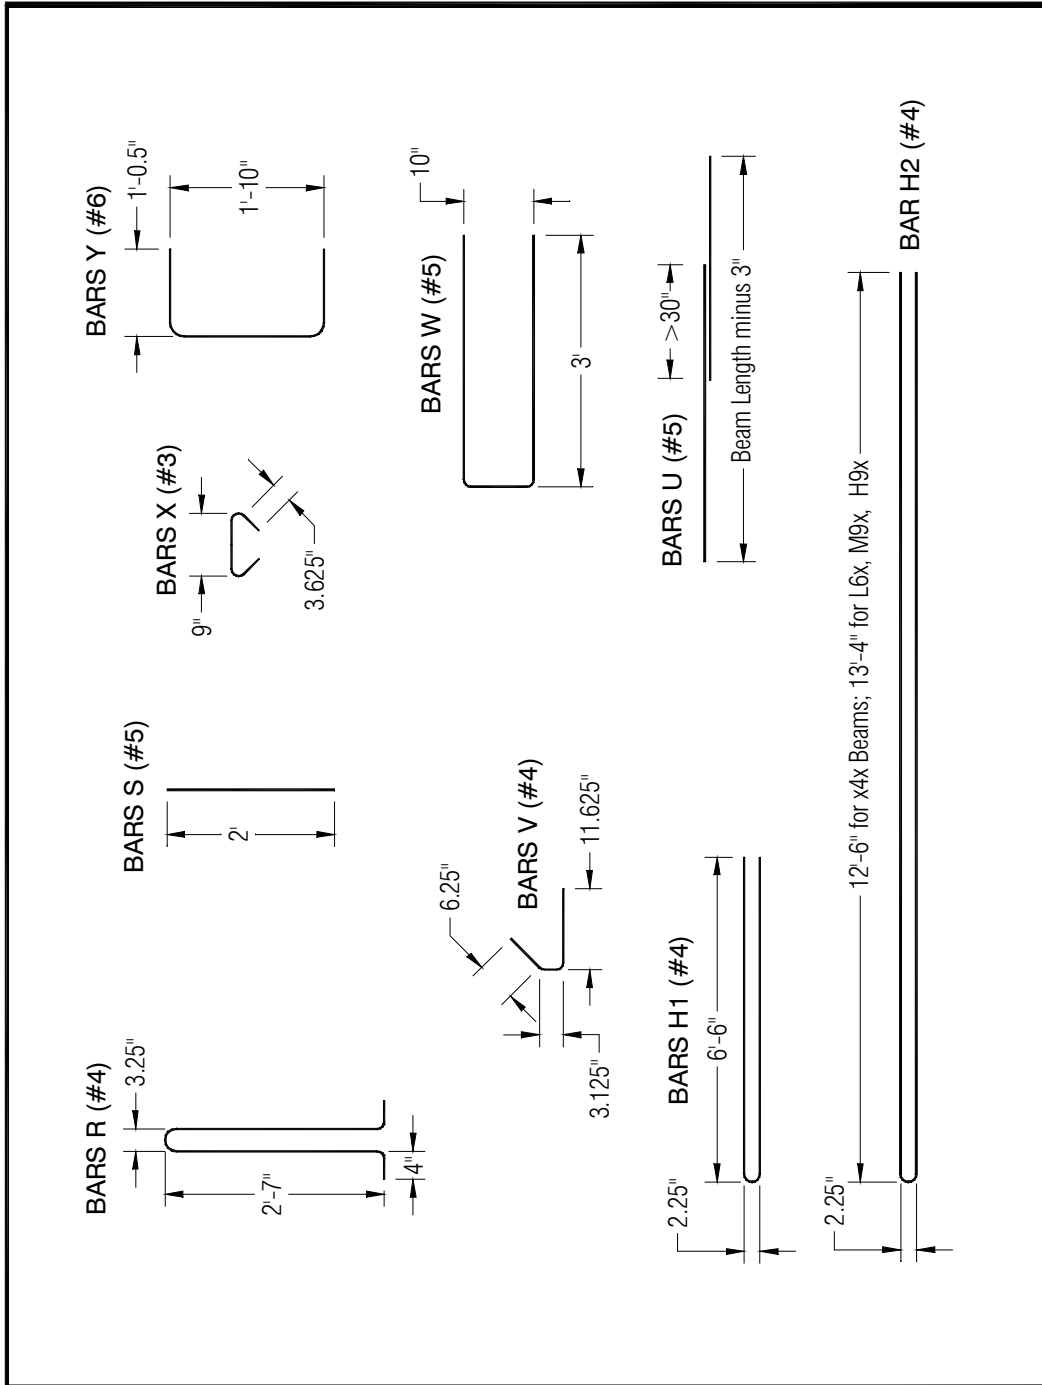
Reinforcement Details (1 in =25.4 mm)
